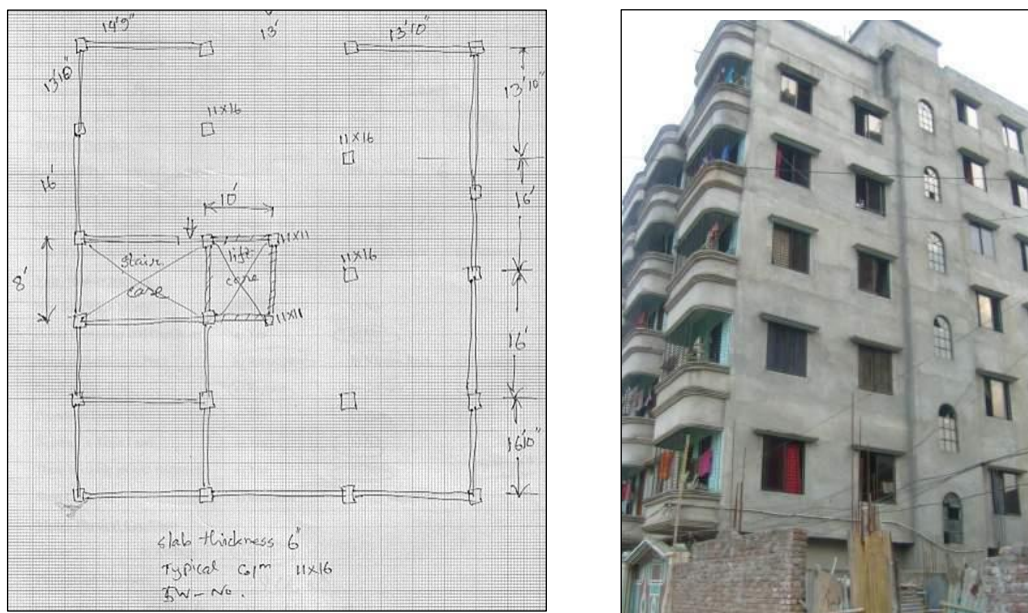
A typical As-built drawing for ground floor plan and photo of building (CDMP, 2009)
